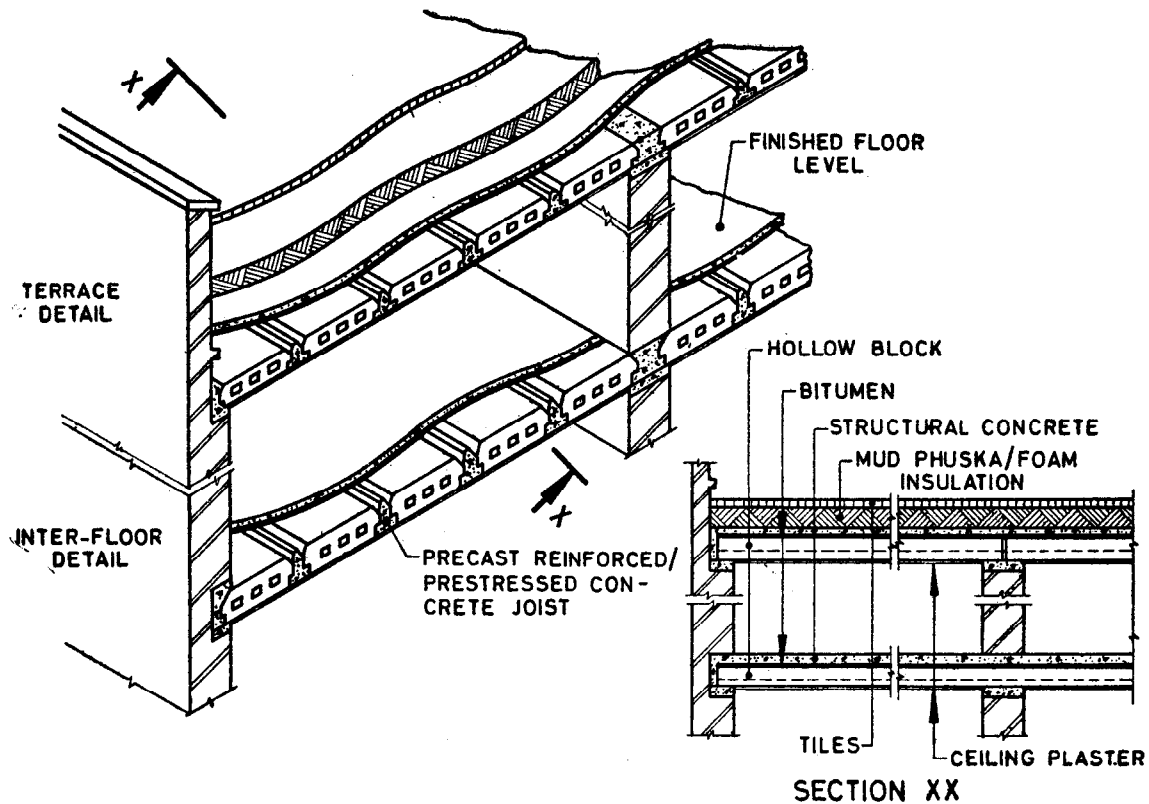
PRECAST CONCRETE JOISTS AND HOLLOW FILLER BLOCK
